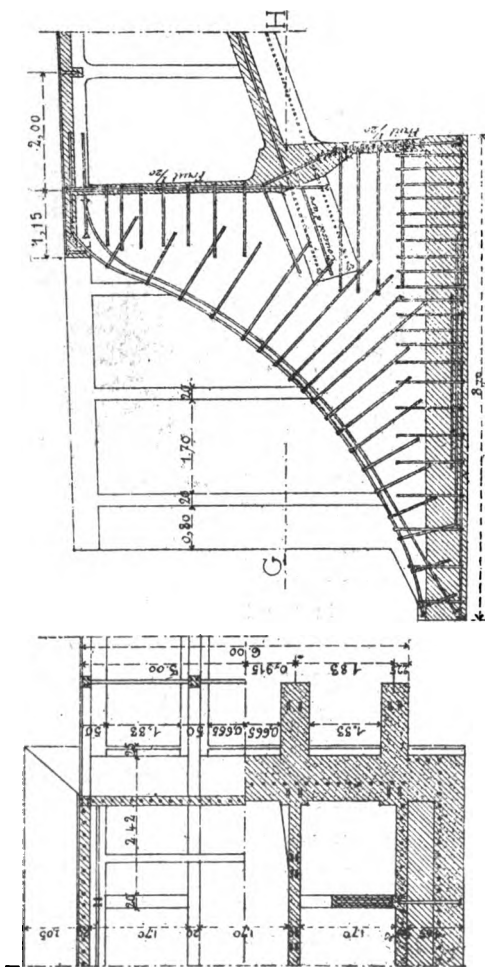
Section through Abutment of Bridge at Chateaufort. Base plate 30 ft. long. Heavy ribs, in the same plan as the arches, transmit thrust to the ground. Reinforced concrete curtain walls connect the ribs and take up the earth pressure.
